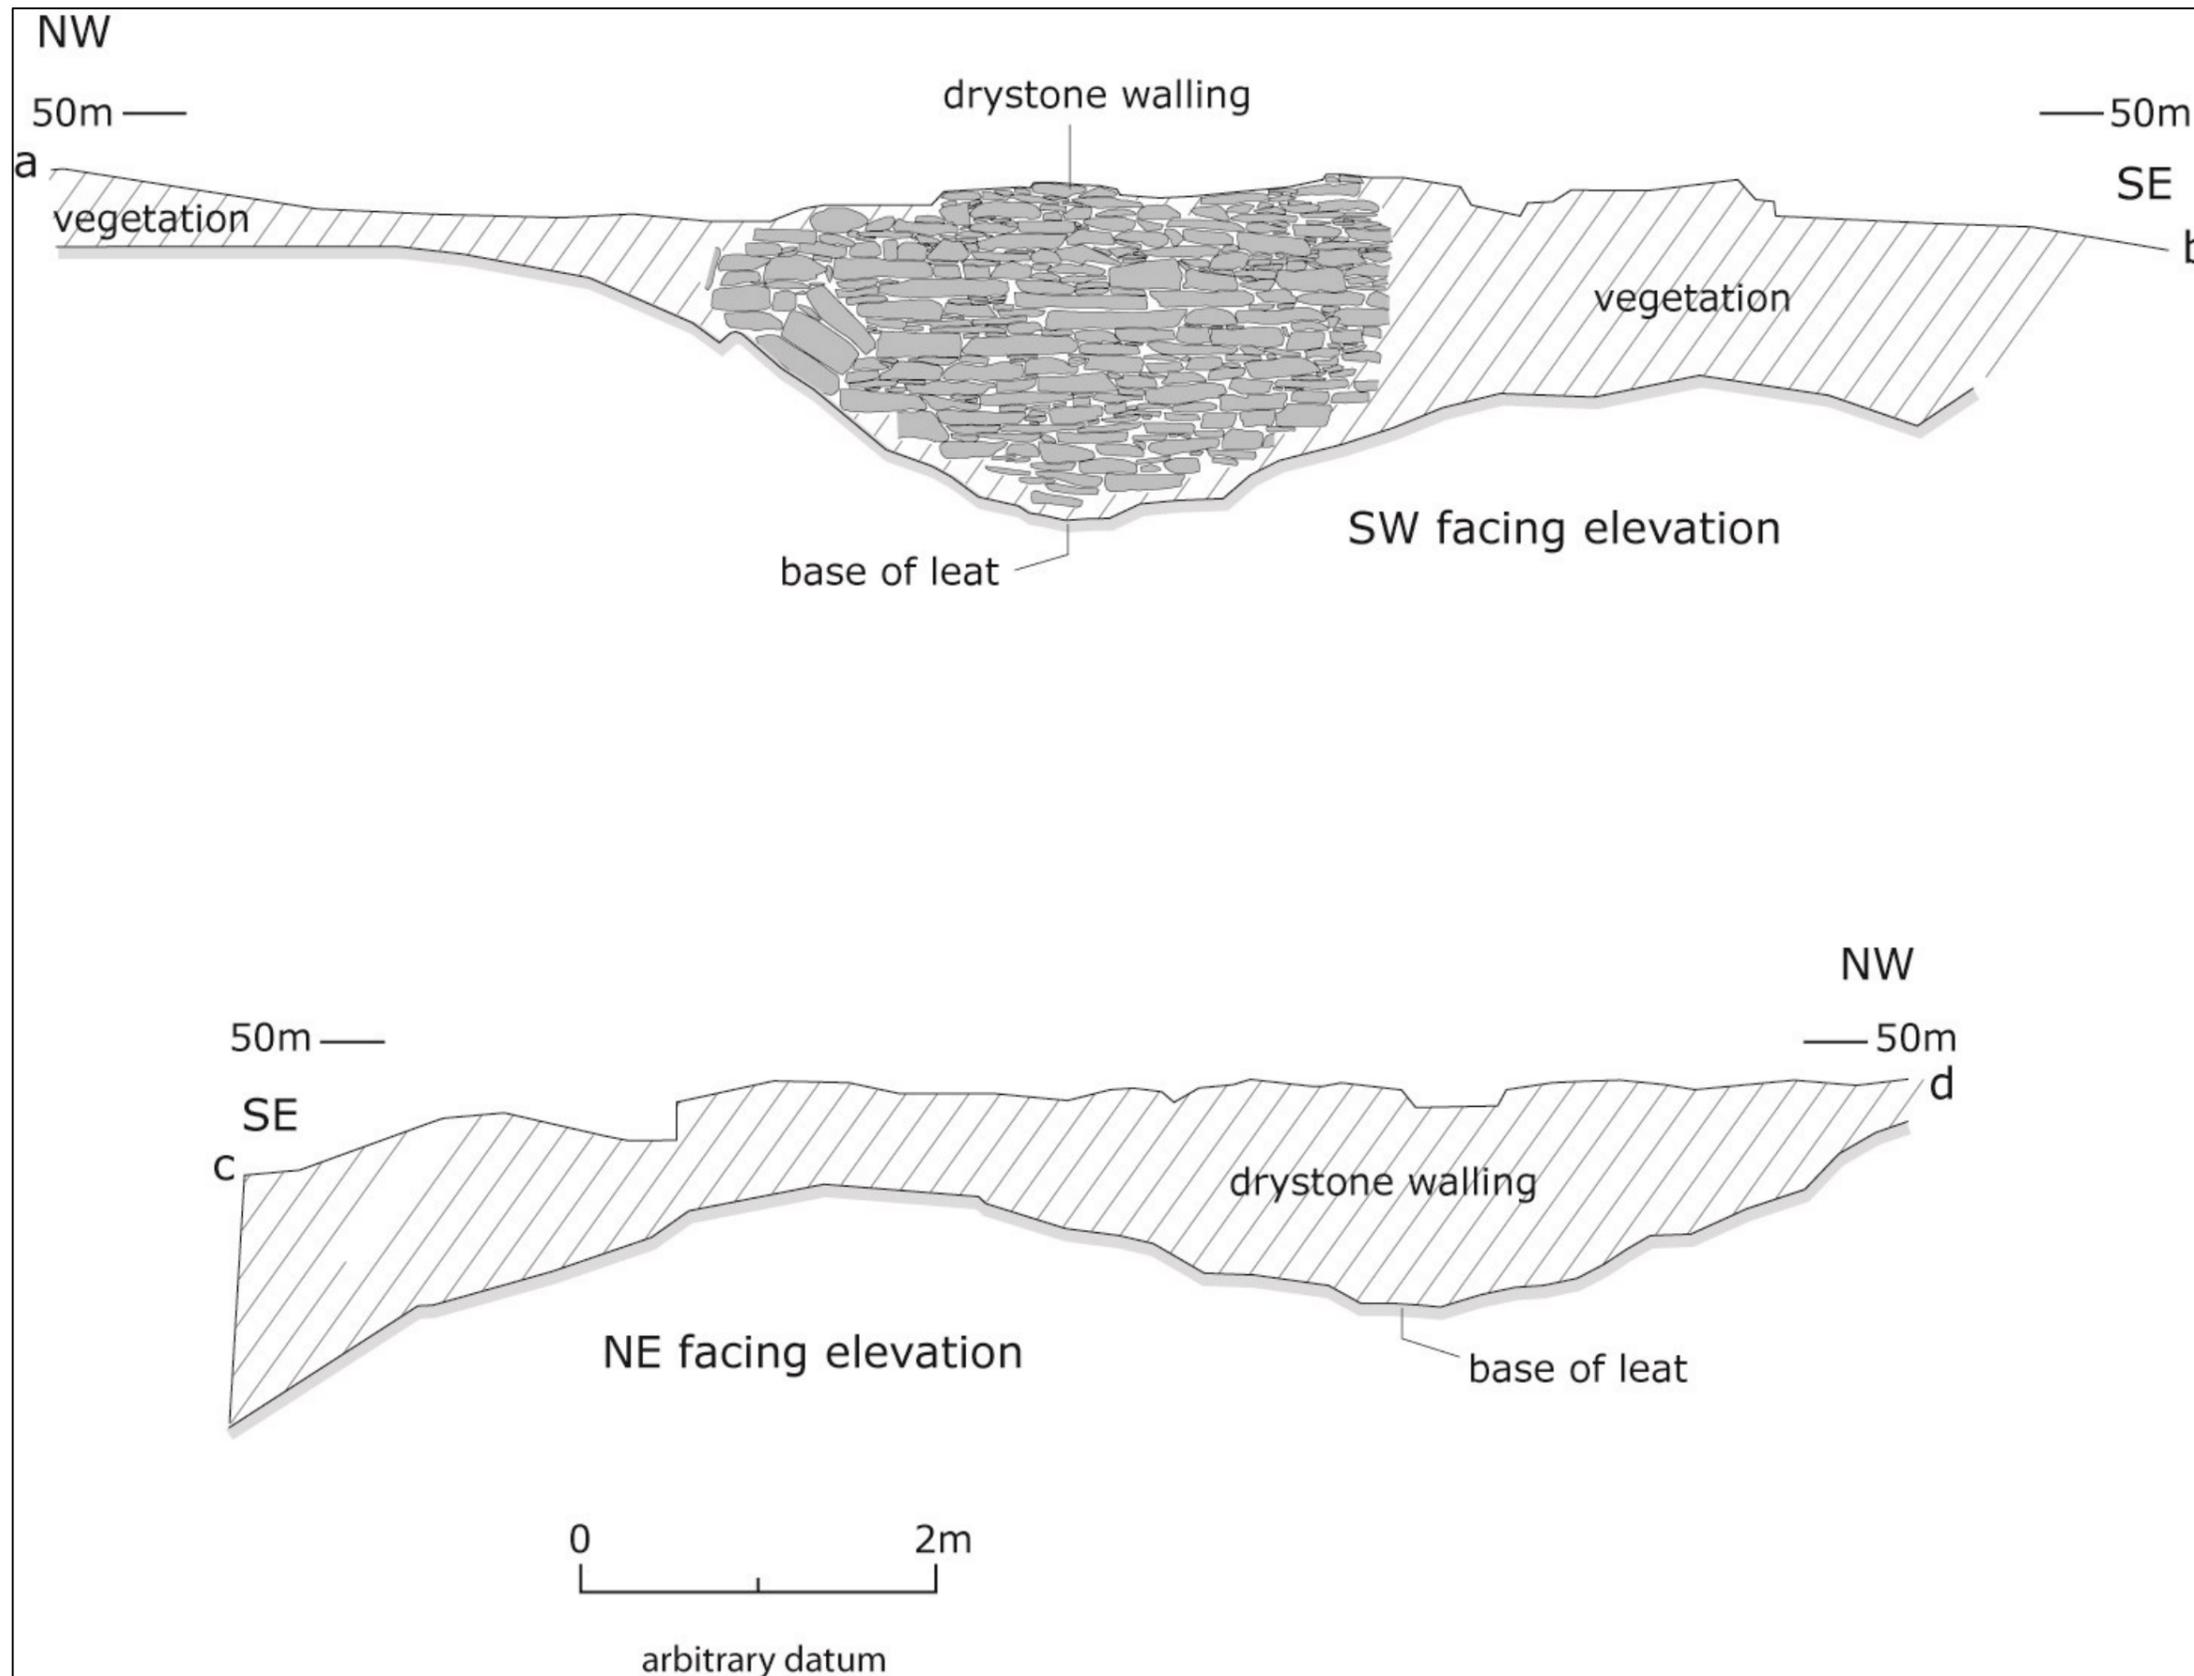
The southwest- and northeast-facing elevations of the northern bridge abutment
